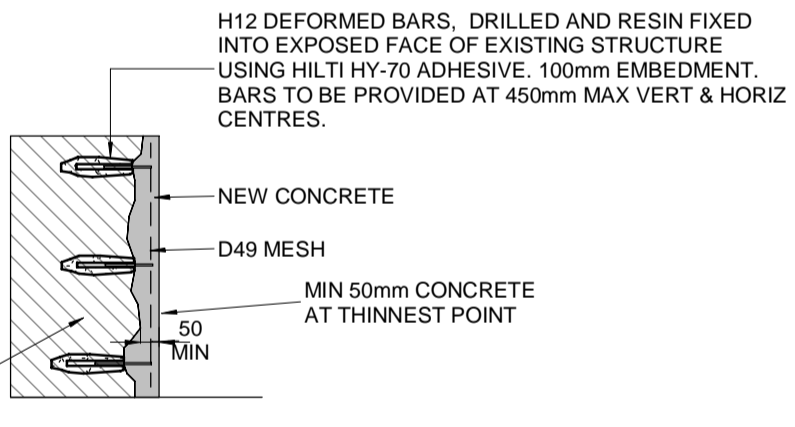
TYPICAL PLINTH DETAIL AT BASEMENT LEVELS
